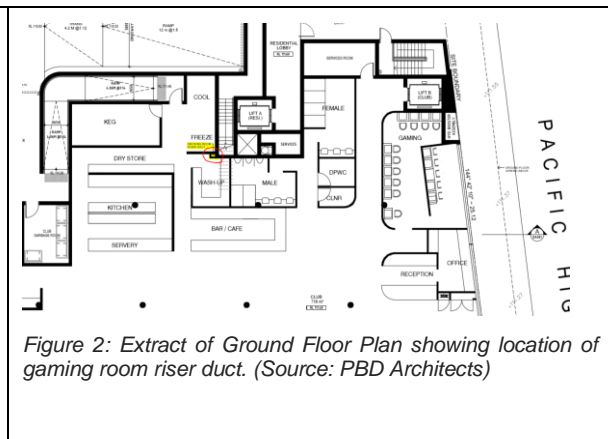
Extract of Ground Floor Plan showing location of gaming room riser duct. (Source: PBD Architects)
